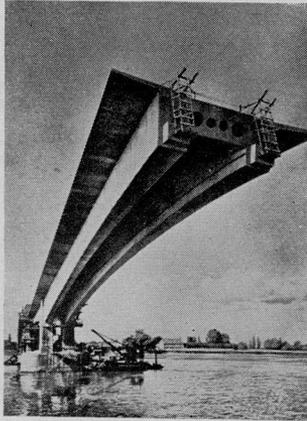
ZEISS DYWIDAG CONSTRUCTION OF WIDE BRIDGE SPANS BY MEANS OF PRESTRESSED UNITS.
